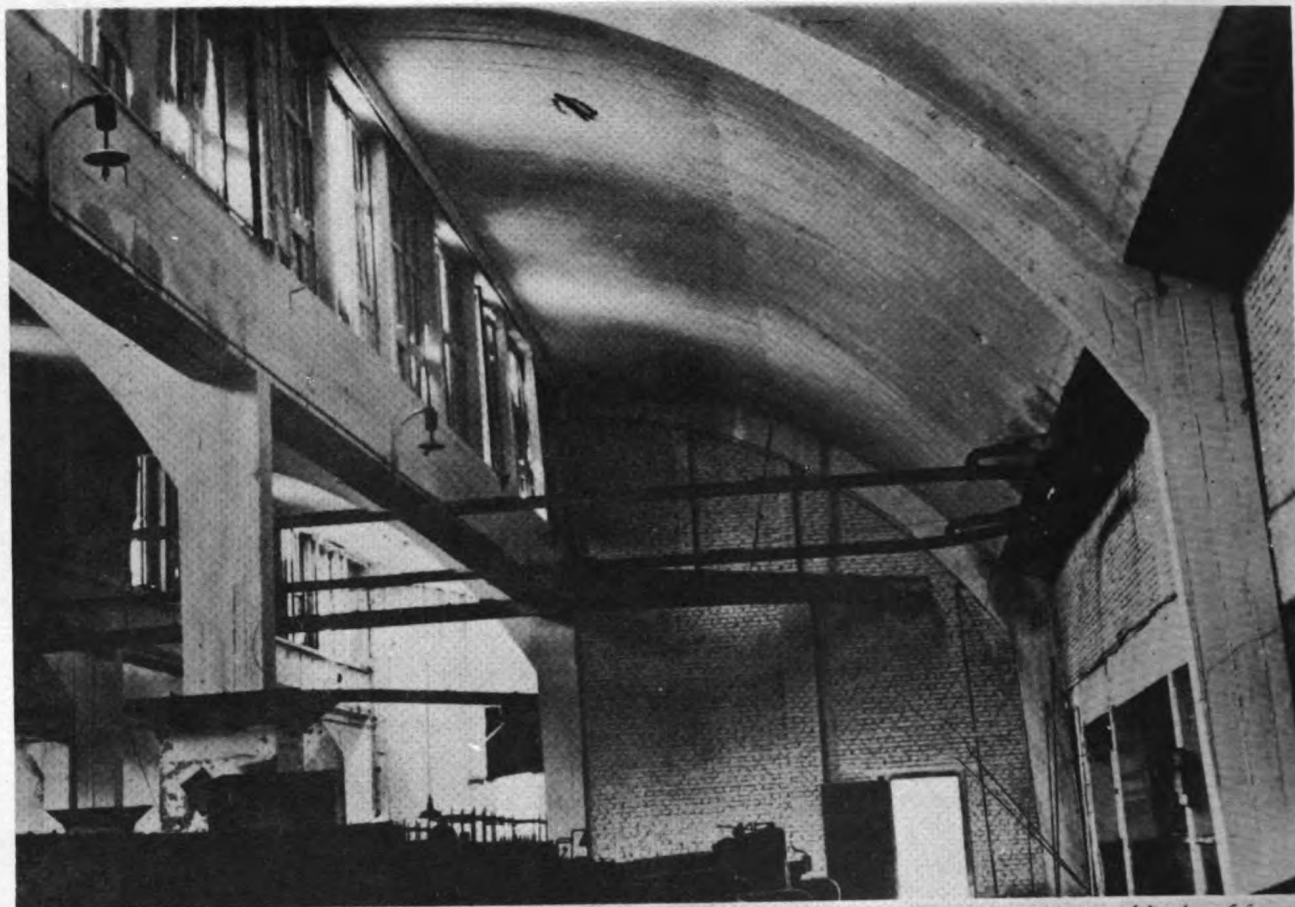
Bldg. I - Portions sustaining superficial damage were walled off and repaired, with floor space reclaimed.
